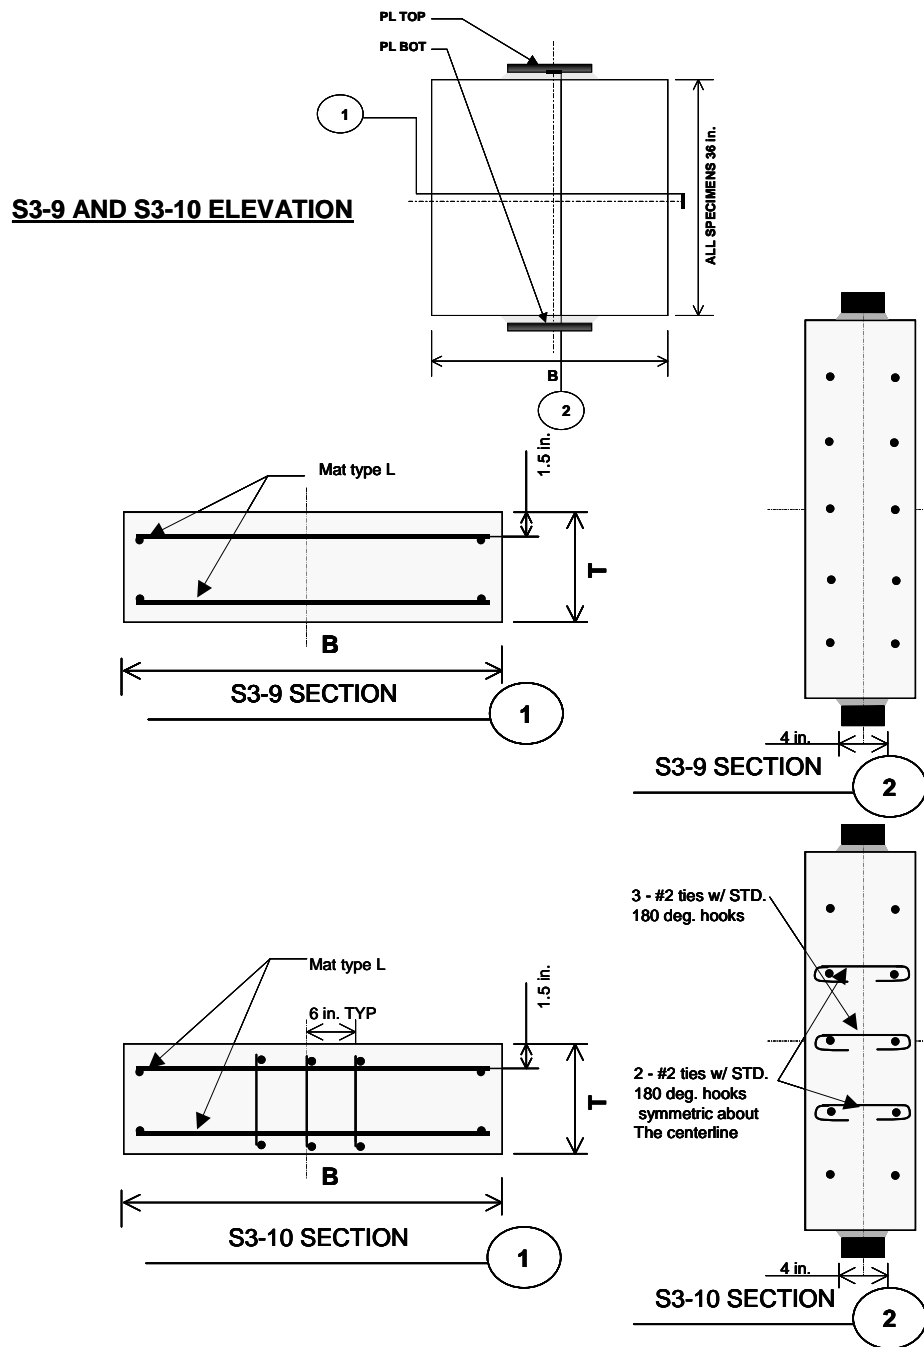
Specimens S3-9 and S3-10 Non-Standard Details
